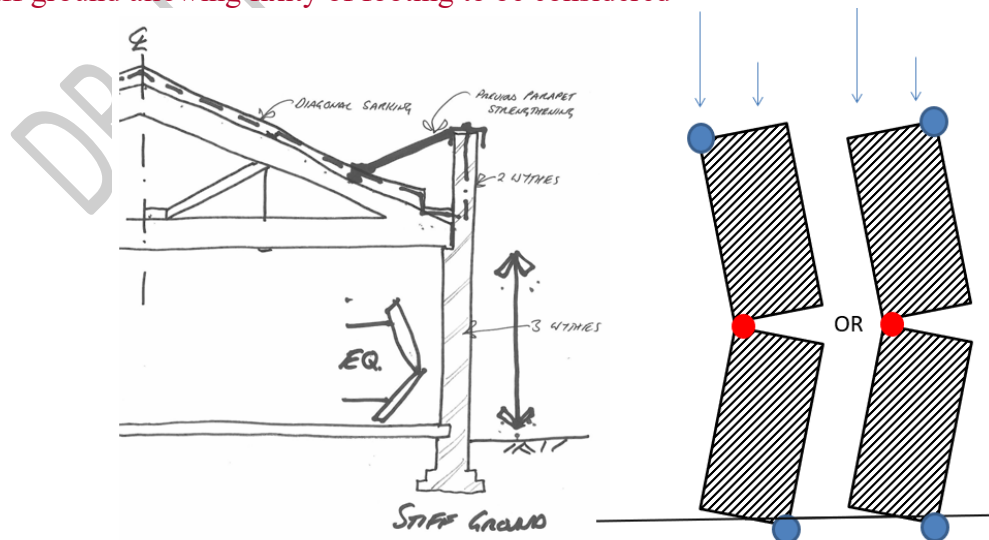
B.33: Boundary conditions for single storey wall with secured parapet above
